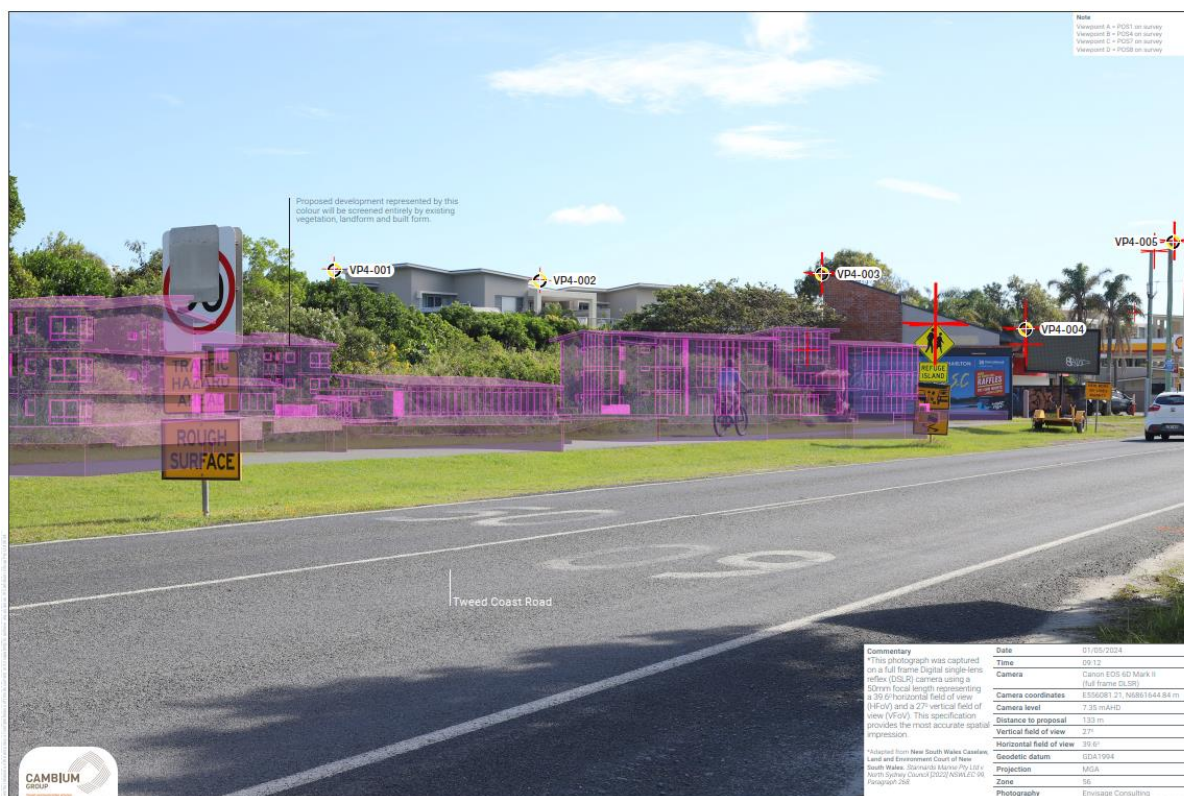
| Concealed Views Facing North (Source: Envisage)
